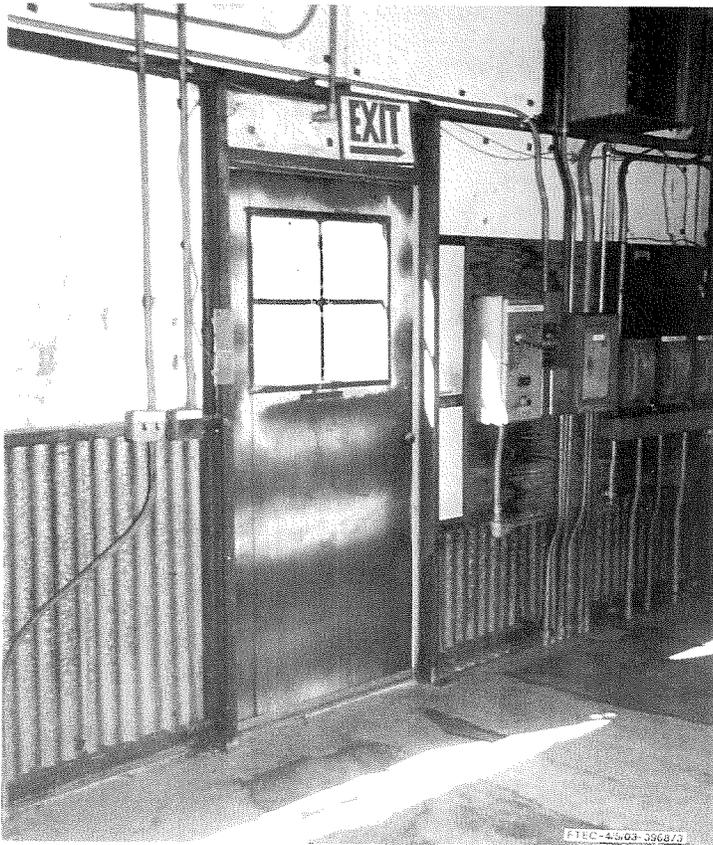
(Left): View of South-Western area of Building T029, including pedestrian entrance.
